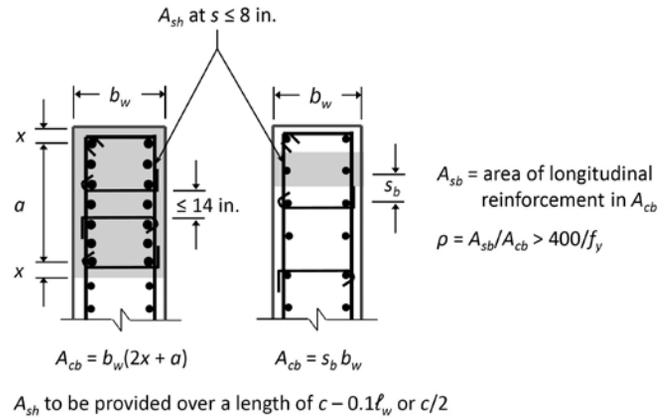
"Local" reinforcement ratio at shear wall boundary.
